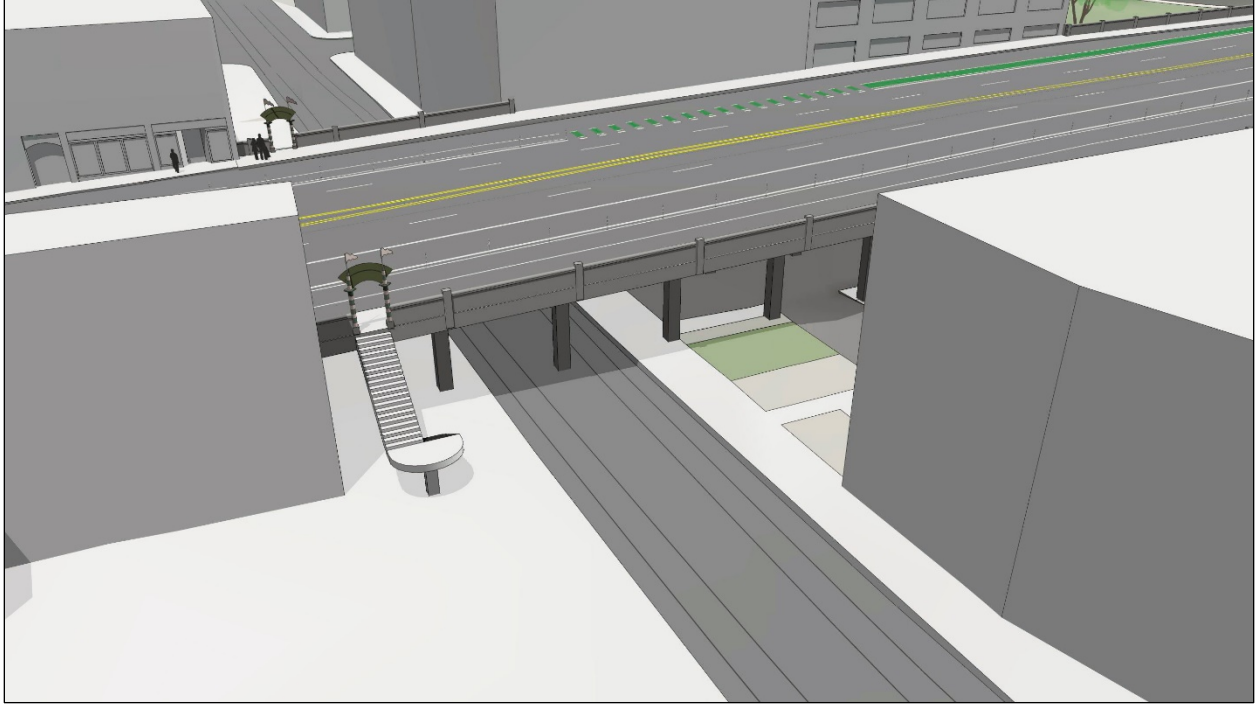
Reed Building, artist's rendering of existing condition of west approach, aerial view looking northeast (Fat Pencil Studio, 2021).
